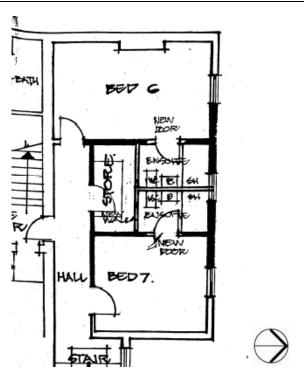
Fortune of War Hotel, 137 George Street, alterations to the first floor (rear), 1989. Source: PMNSW ROX 410 DA 0017/DR & ROX 410 DA 0018/DR – details.
